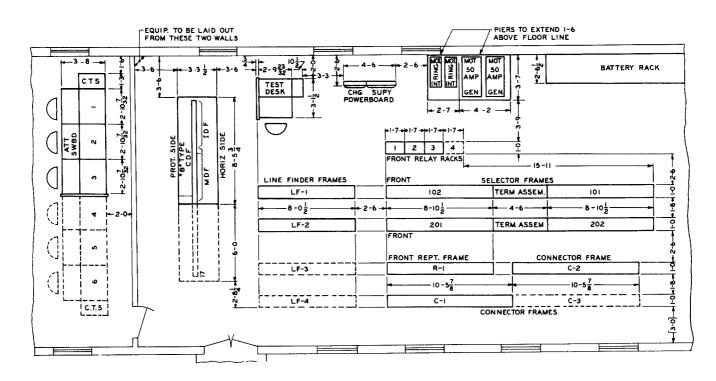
No. 119 Switchboard - Floor Plan (Automatic Electric Co.)
